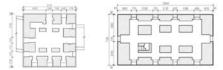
Typology 3-3, 3-4: Floor Plan of No. 39, 19
